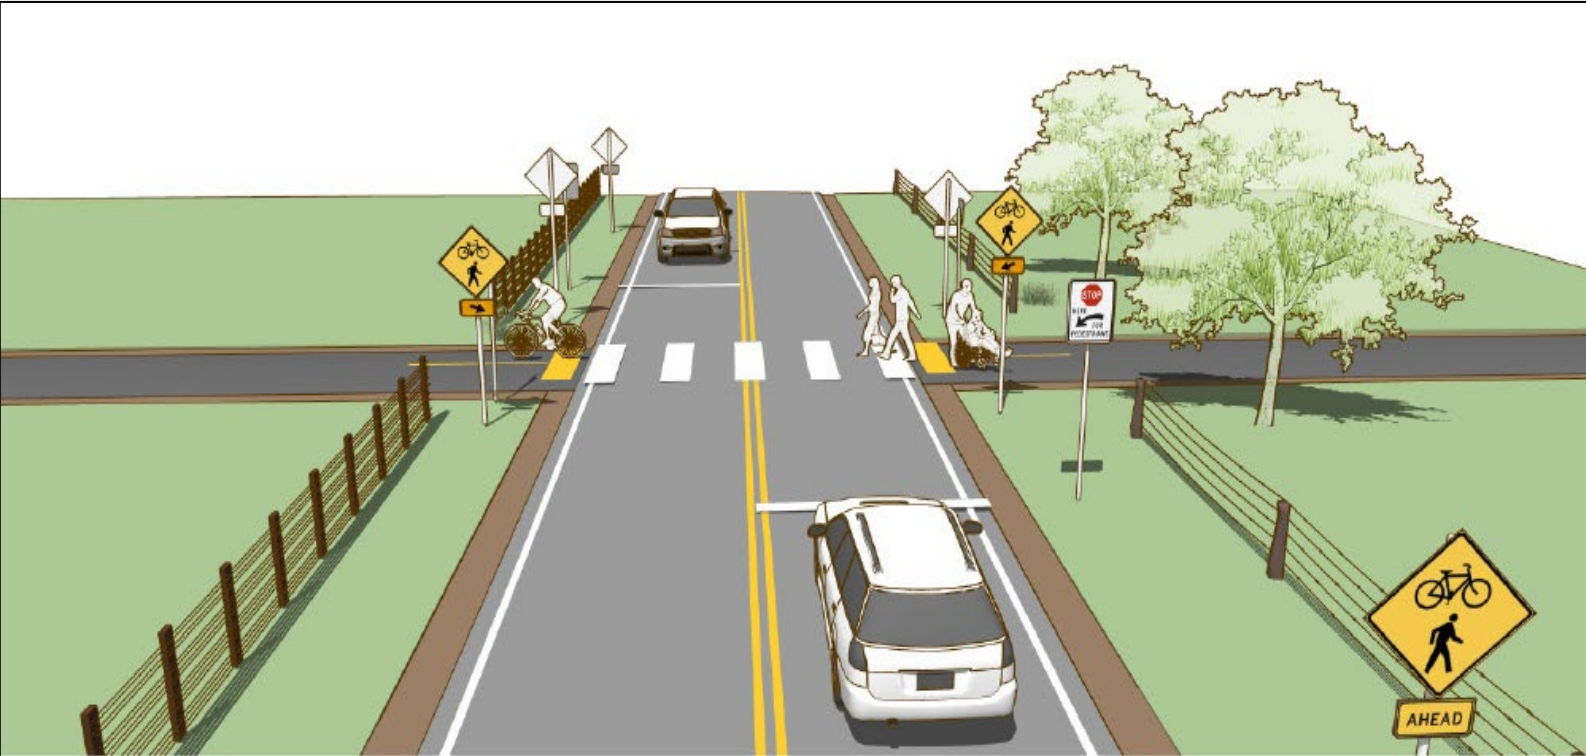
Typical signage and striping depicting pavement marking, W11-15 and W16-7P signage.
